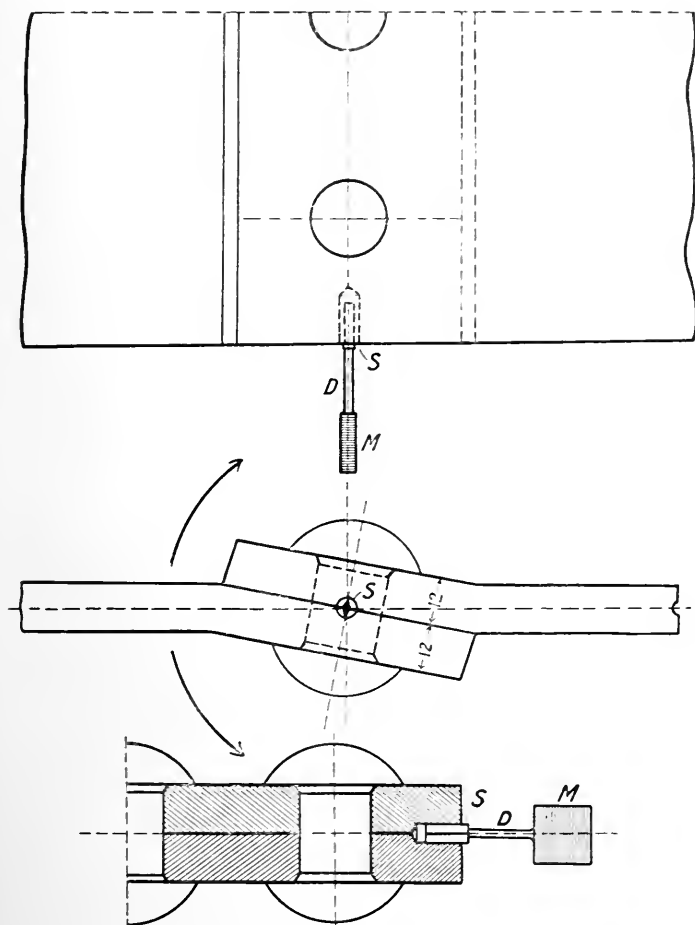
No. 2 Apparatus for Measuring the Slip of Riveted Joints.
